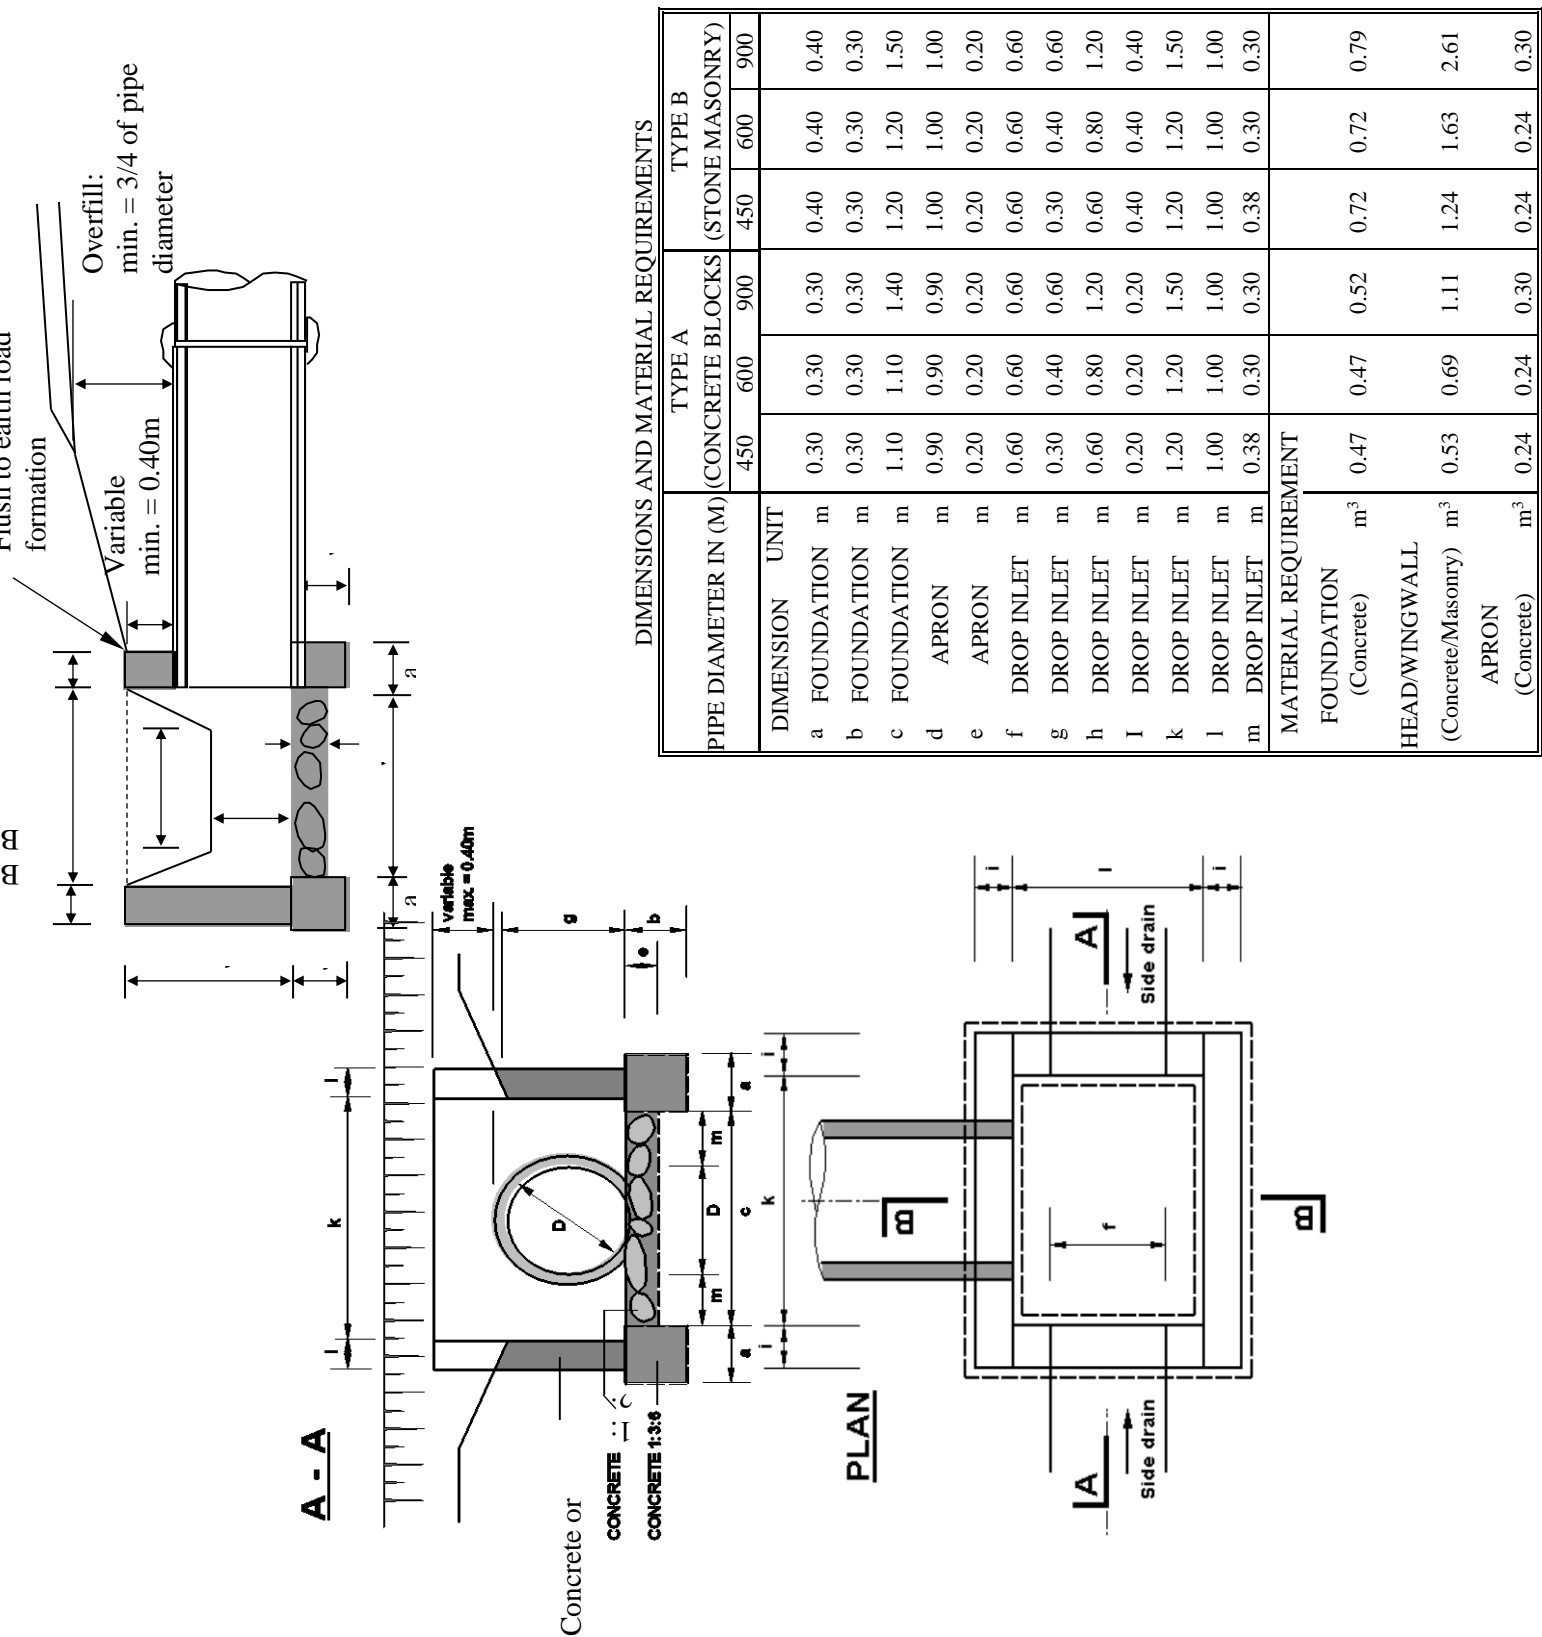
HEADWALL TYPE 3A (CONCRETE BLOCK HEADWALLS)
